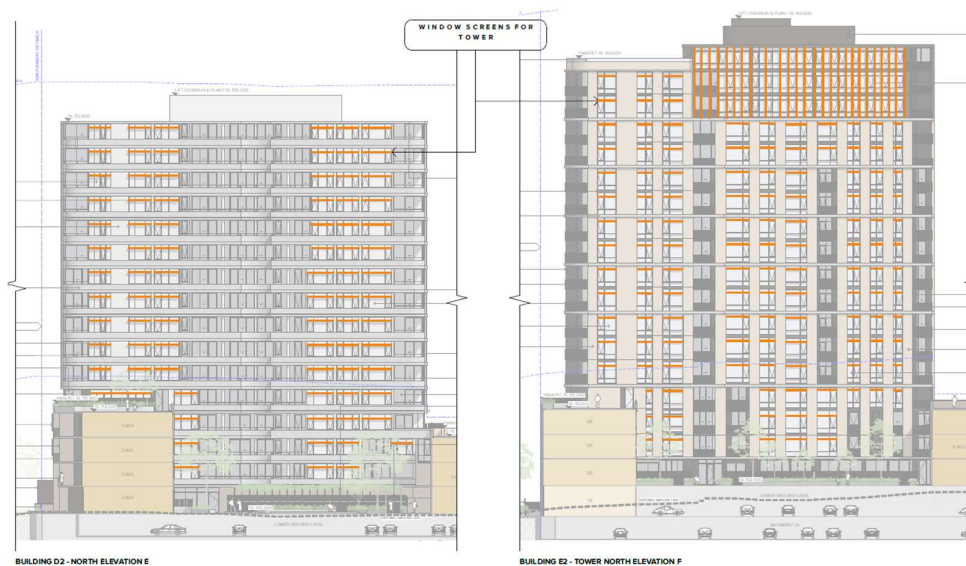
Elevation of window screen locations on towers D2 and E2 which protrude beyond the approved envelope by approximately 250mm (Source: Turner Studio)
